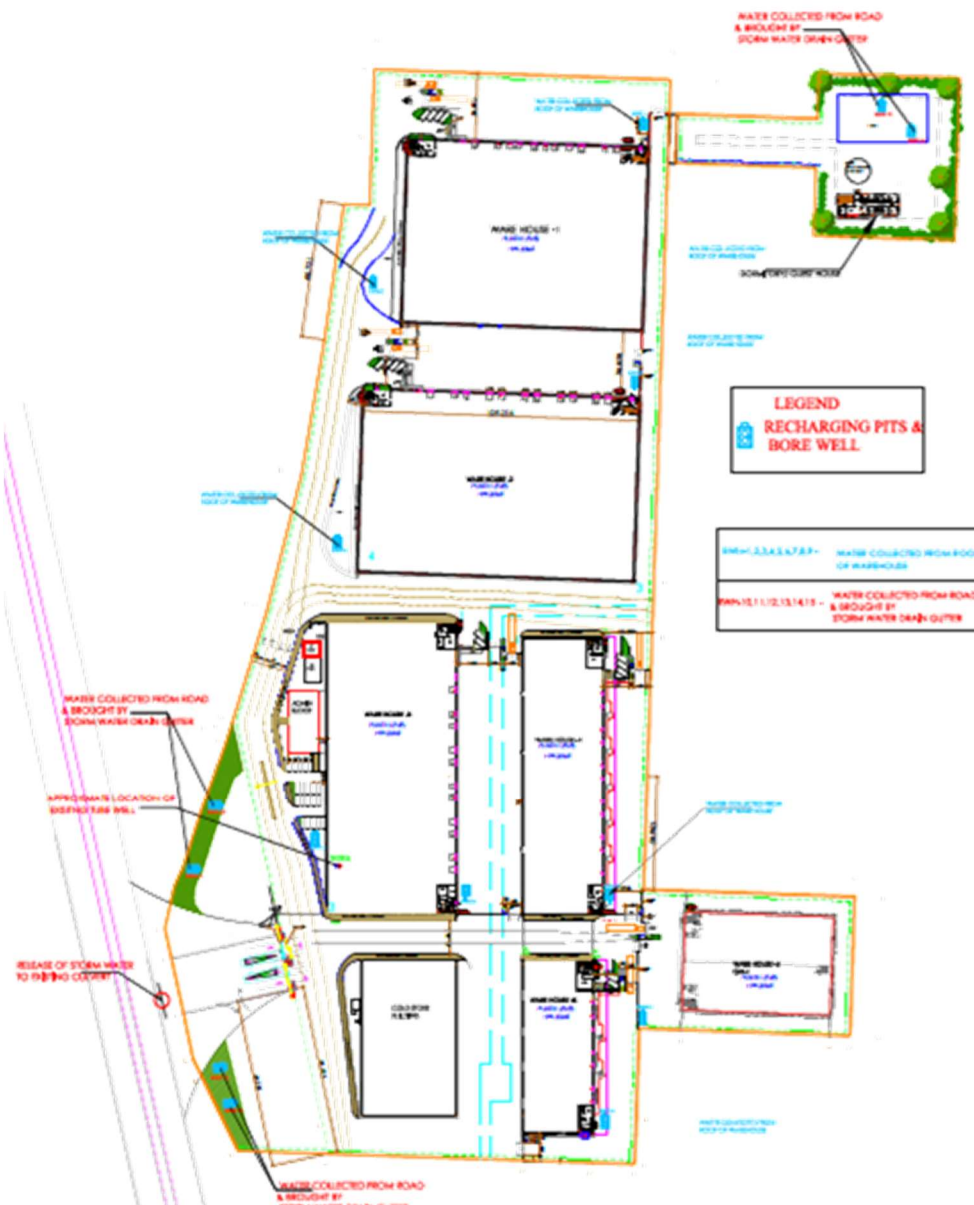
Site Plan ASGN Pvt. Ltd. Sonipat, India (Author, 2014)
